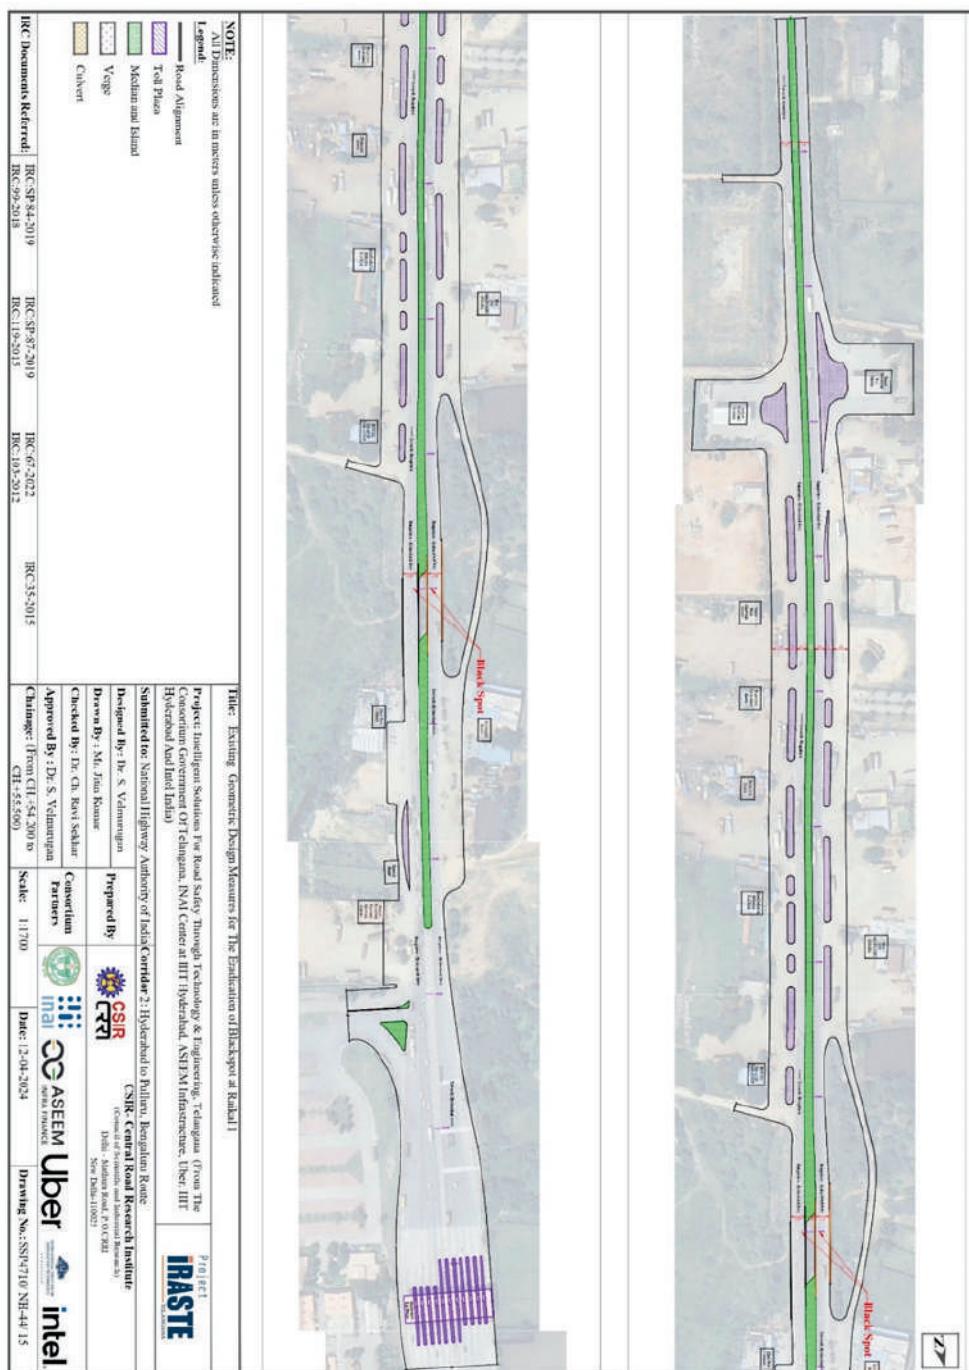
Existing Physical Survey Plan near Raikal 1 Area on NH-44
